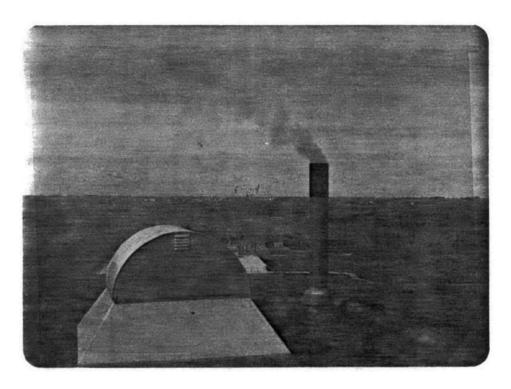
View from the boiler house roof facing southwest. The plant's switchyard and the surrounding area are shown in the background.
